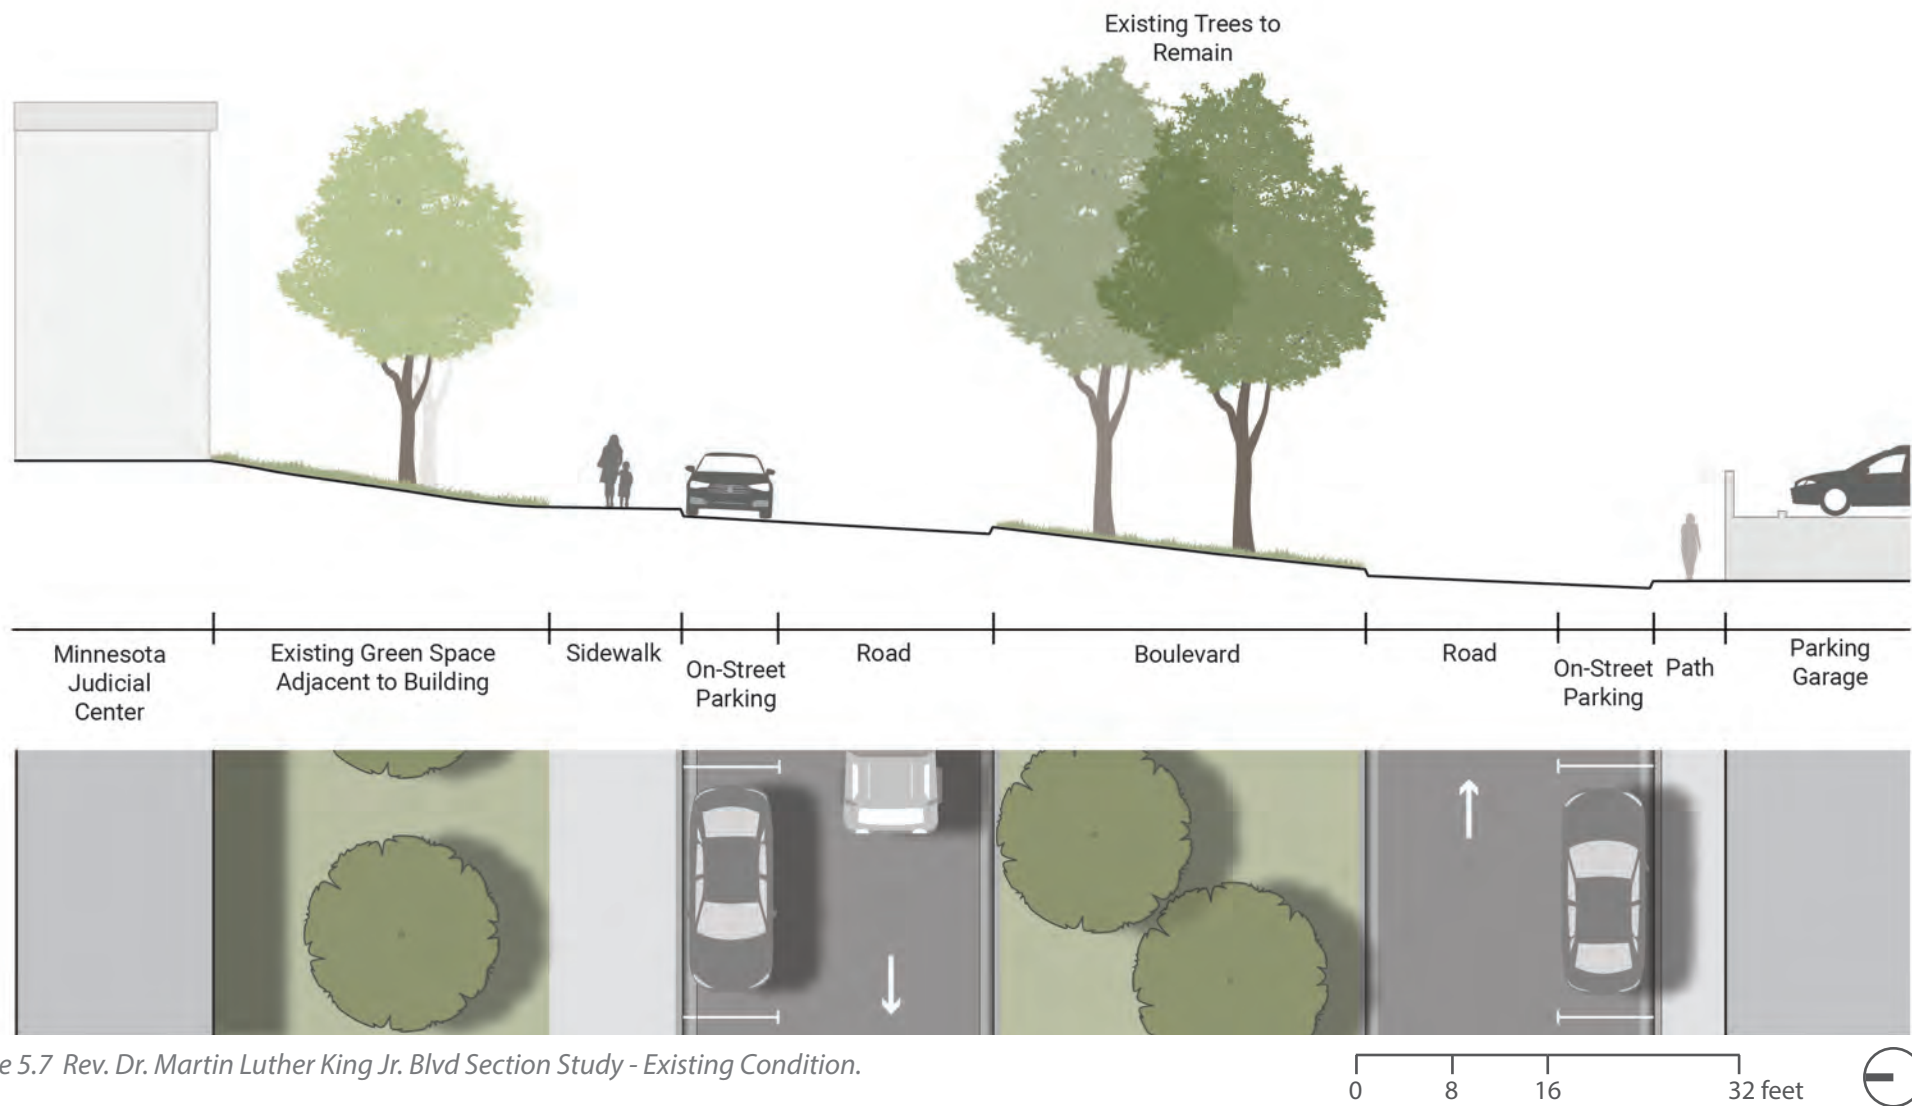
Rev. Dr. Martin Luther King Jr. Blvd Section Study - Existing Condition.
